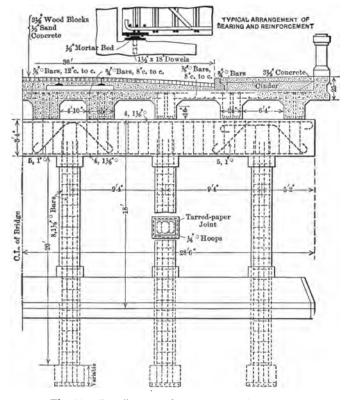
Details Arsenal St. Bridge at St. Louis.
